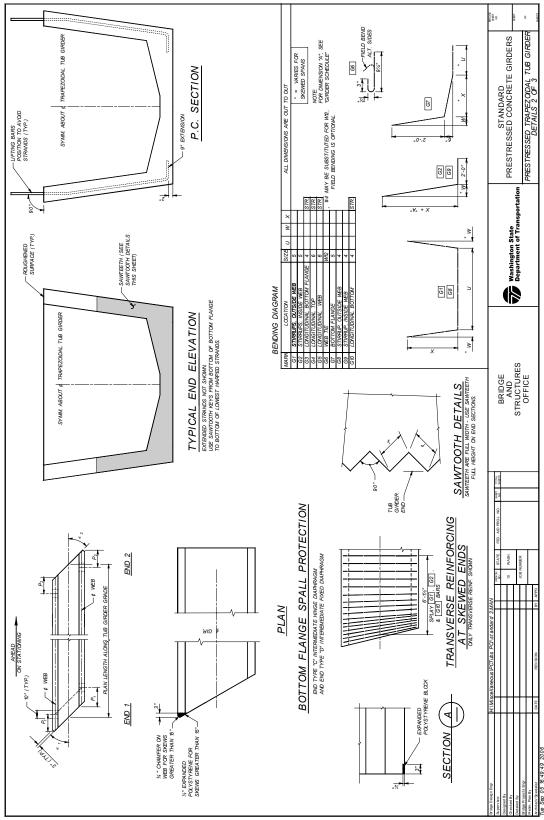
Standard Drawing for Trapezoidal Tub Girder, 2 of 3
